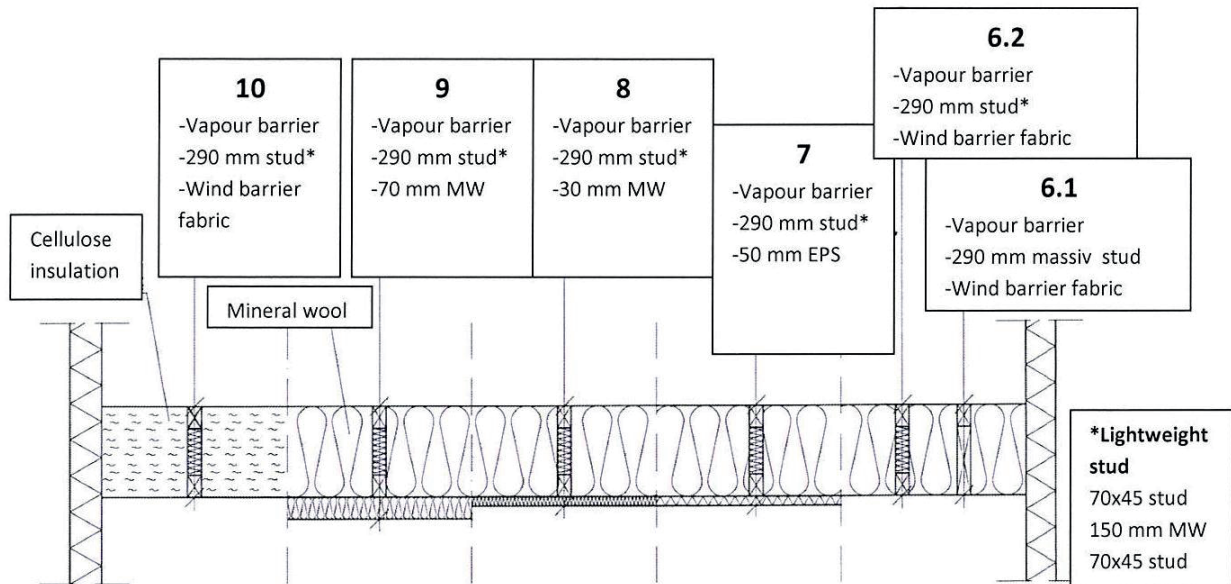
Horizontal cross-section through the test wall, showing the different structural constituents. The inside face of all designs consisted of plastic film as an air and moisture barrier.
